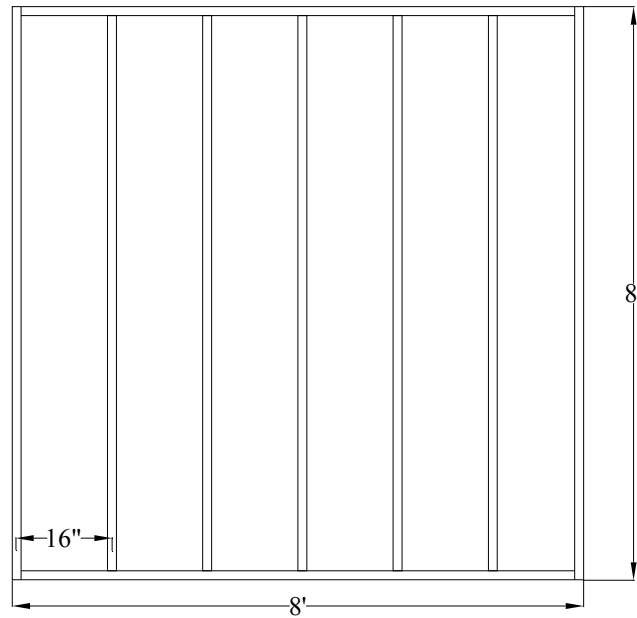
Schematic of an 8 by 8-ft. Test Wall with 16-in. Spacing
